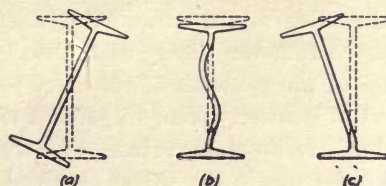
SHAPES ASSUMED BY I-BEAMS AFTER WEB FAILURE.
